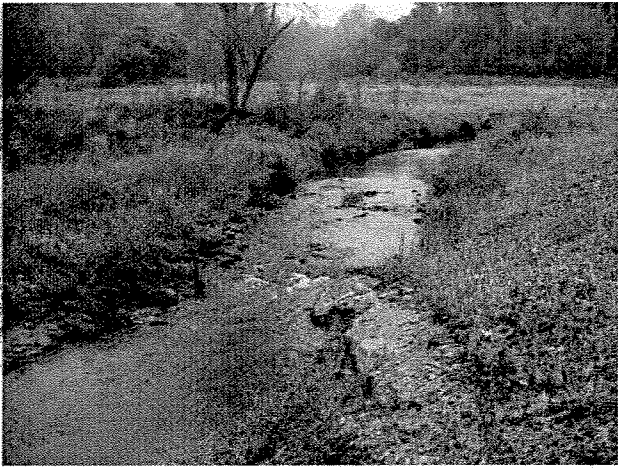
Looking upstream at log toe protection and root wad installed between MS Stations 23+50 and 23+00 area. (9/27/04)
